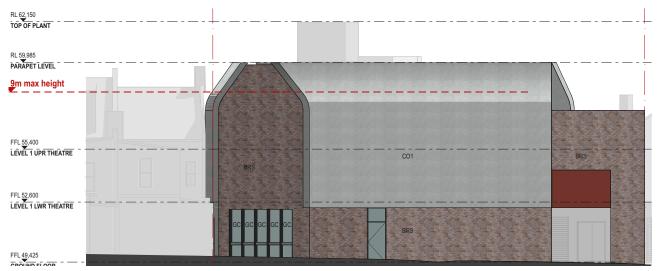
North Elevation - Laneway. Source: TZG Architects, 2022.
